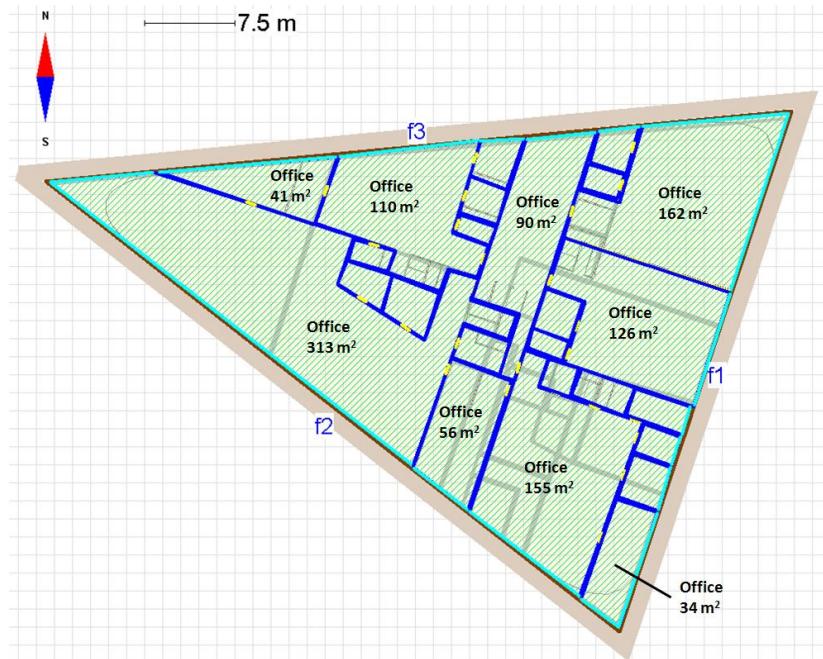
The floor plan of the office floors, areas of open office spaces presented.
